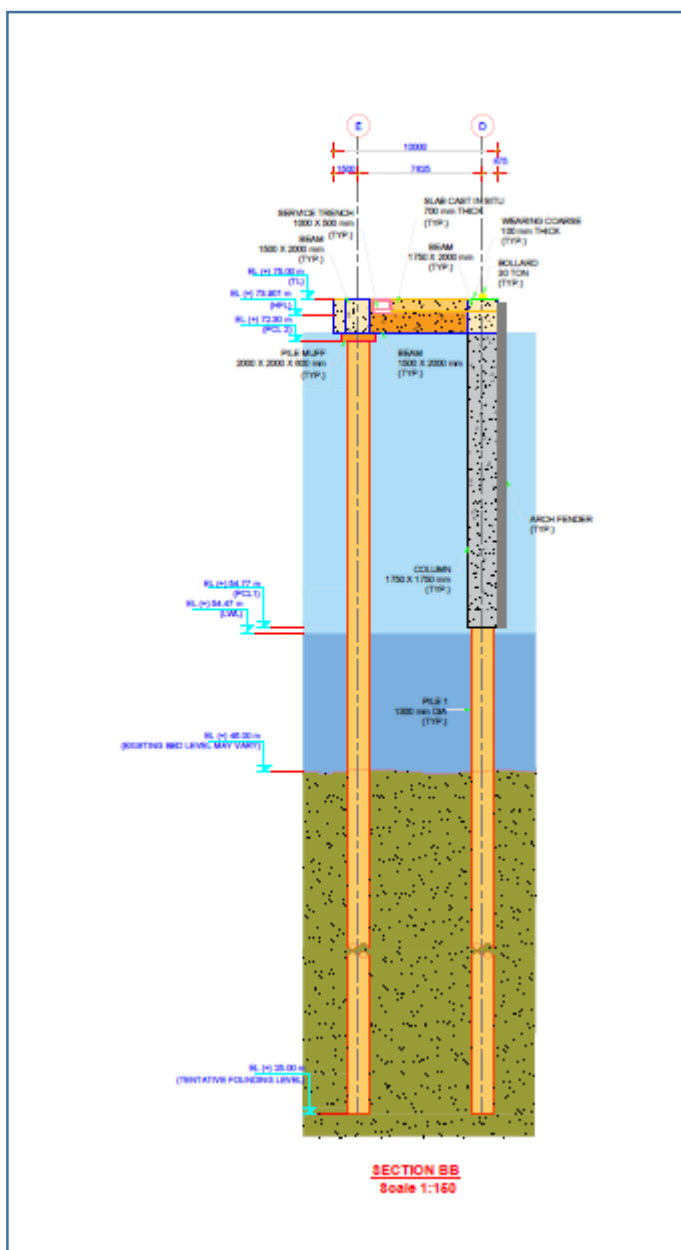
4 Cross-Section of Boat Hoist Jetty(Section-BB) of Ship Repair Facility in Varanasi
